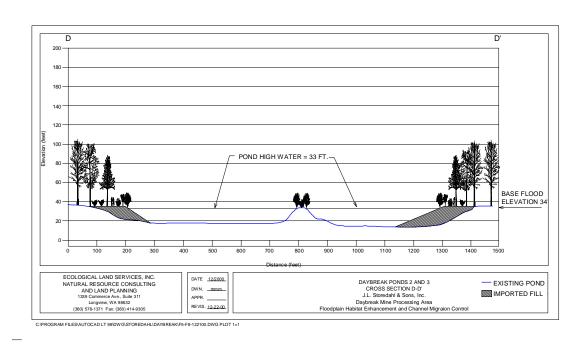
(continued). Conceptual section view of proposed fill plan for Daybreak Ponds.
